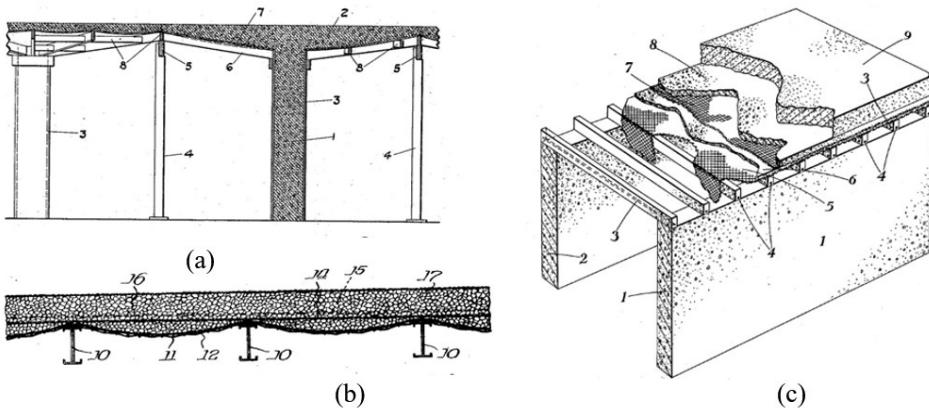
The fireproof slab produced from a textile mould. Adapted from [5].
